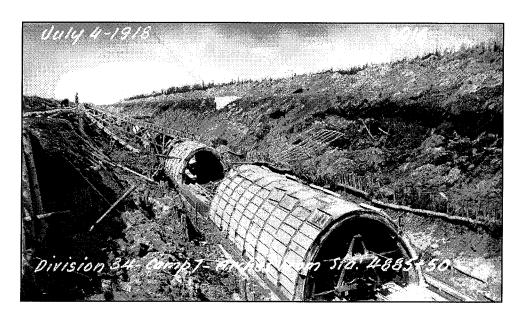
Arches cast-in-place using steel forms. The arch segments were cast in 13.7 metres lengths that covered three, 4.57 metres invert segments.
